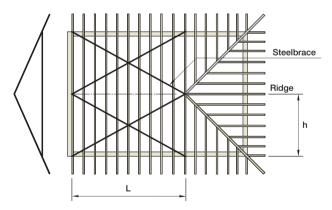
Steelbrace layout for standard trusses of hip roof
